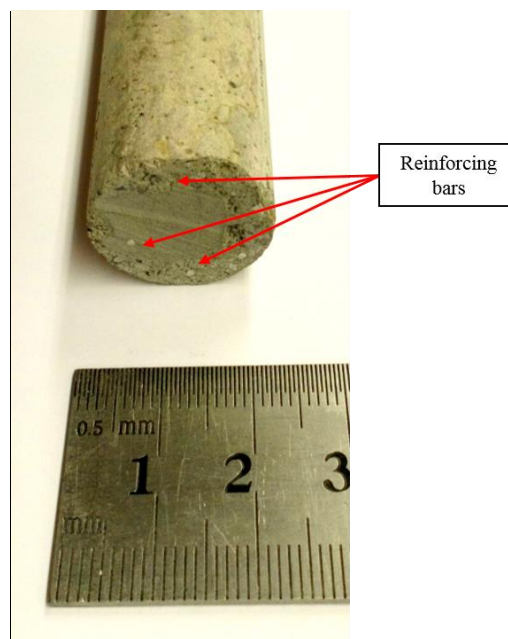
Schematic of scaled reinforcing steel cage cross-section
